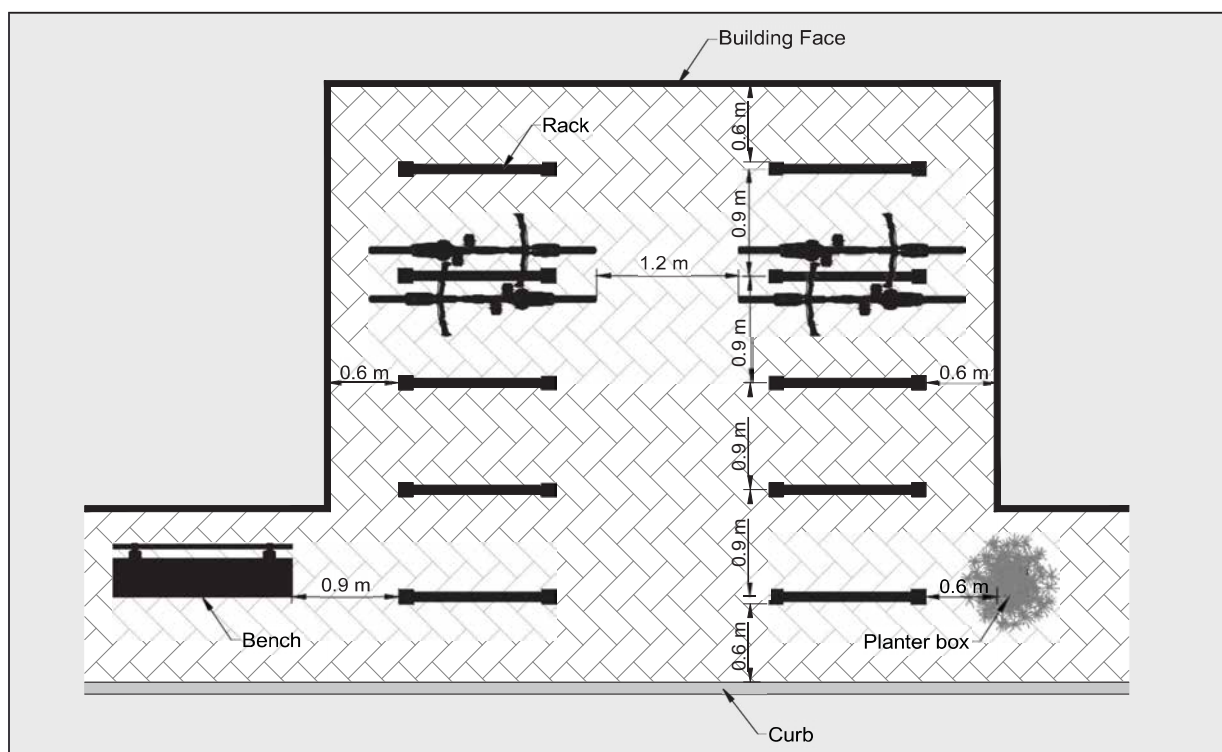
Typical Bicycle Parking Layout on Sidewalk
